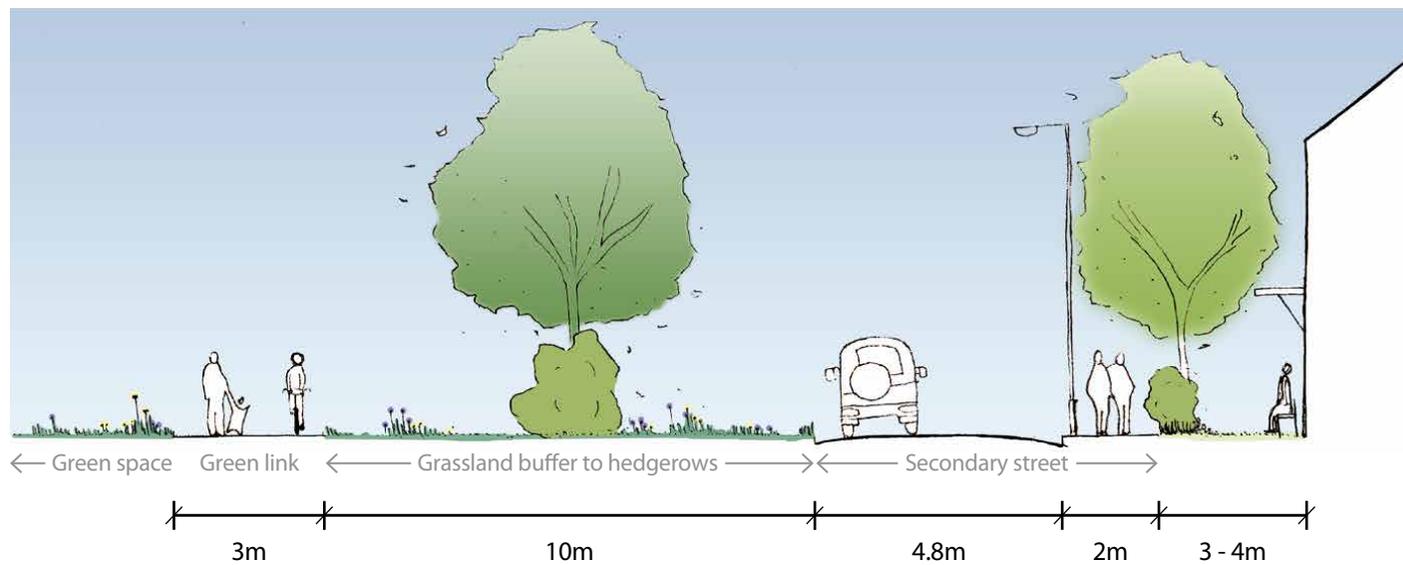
B-B – typical secondary street cross section (refer to Fig. 16 for section location)
